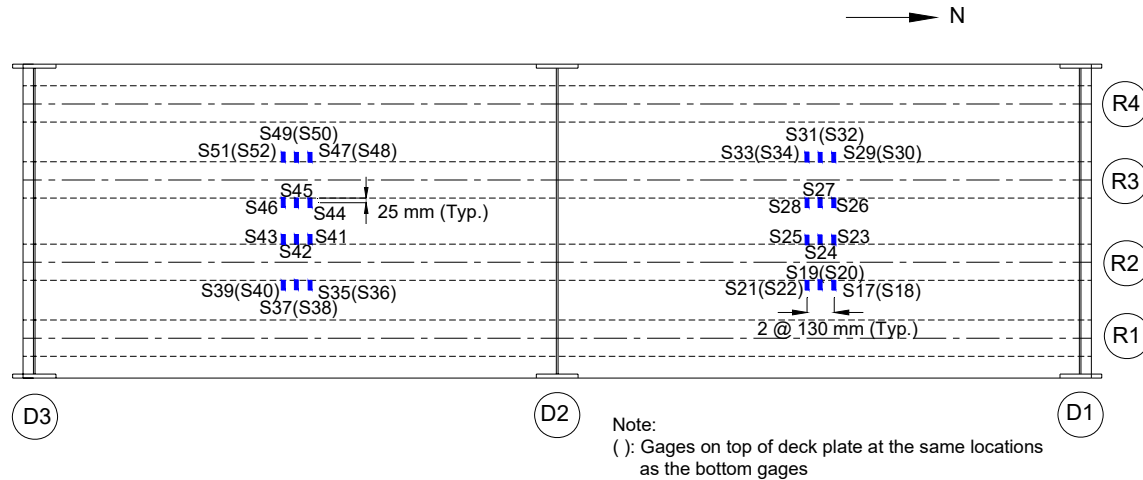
Specimen 6: Uni-axial Strain Gages in Deck Plate near Rib-to-Deck Welds
